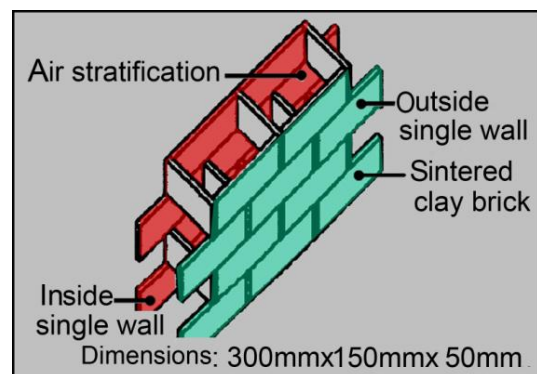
Schematic of external brick wall in traditional dwelling
